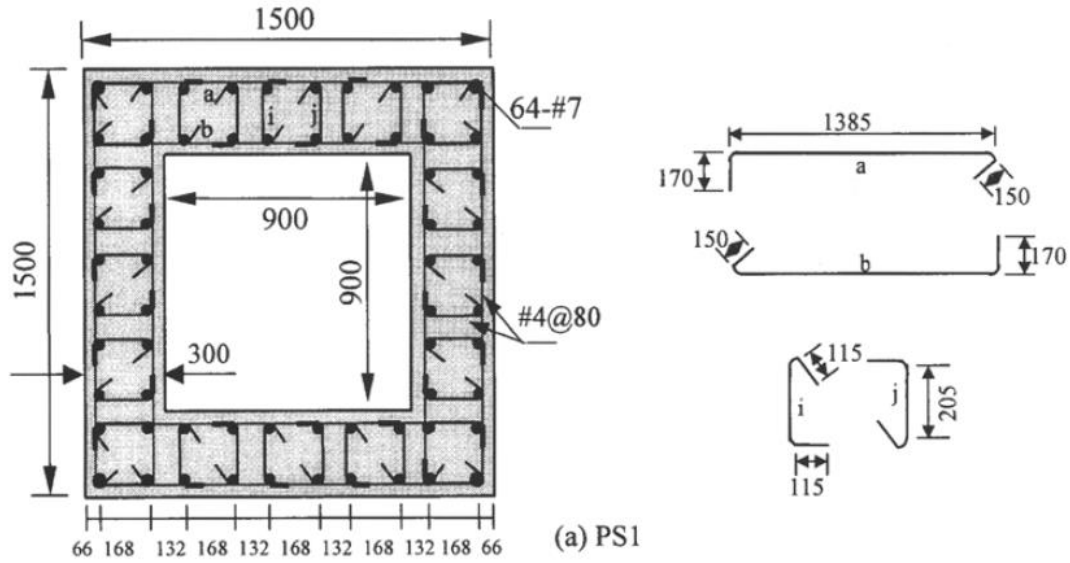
Cross Section Dimensions of Specimen PS1 Tested by Yeh et al. (2002)
